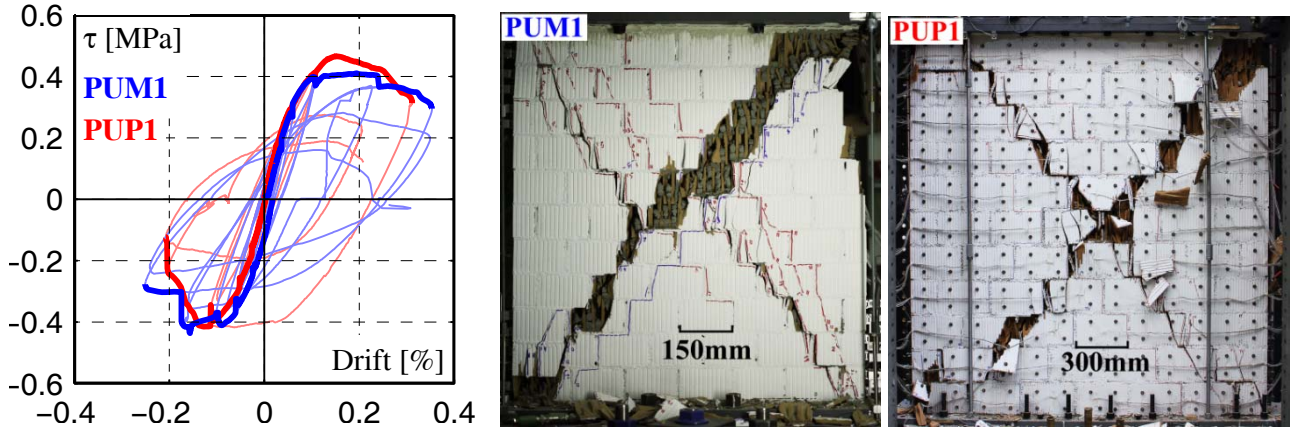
Half-scale tests: Comparison of hysteresis and crack pattern at failure of half-scale test (PUM1) to full-scale test (PUP1) [18].
